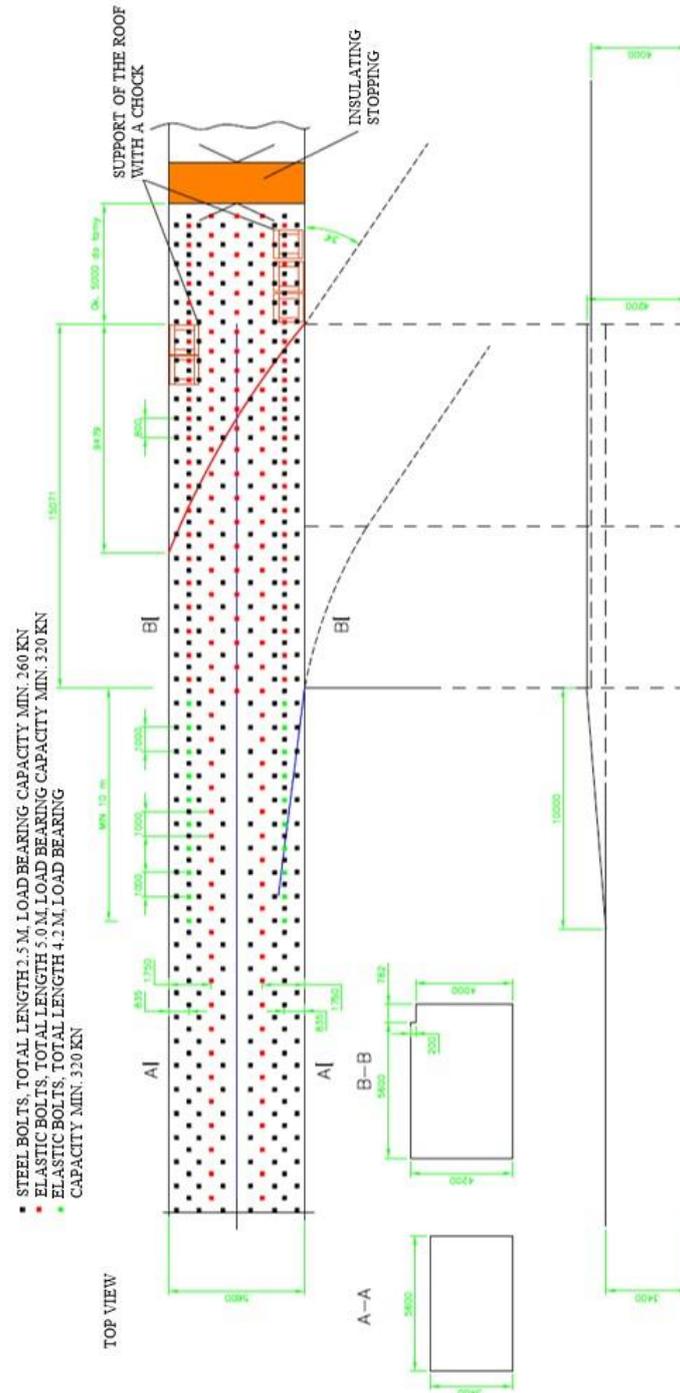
Driving method of the bend No. 2 in the Bw-1n test roadway – Stage I [134]
